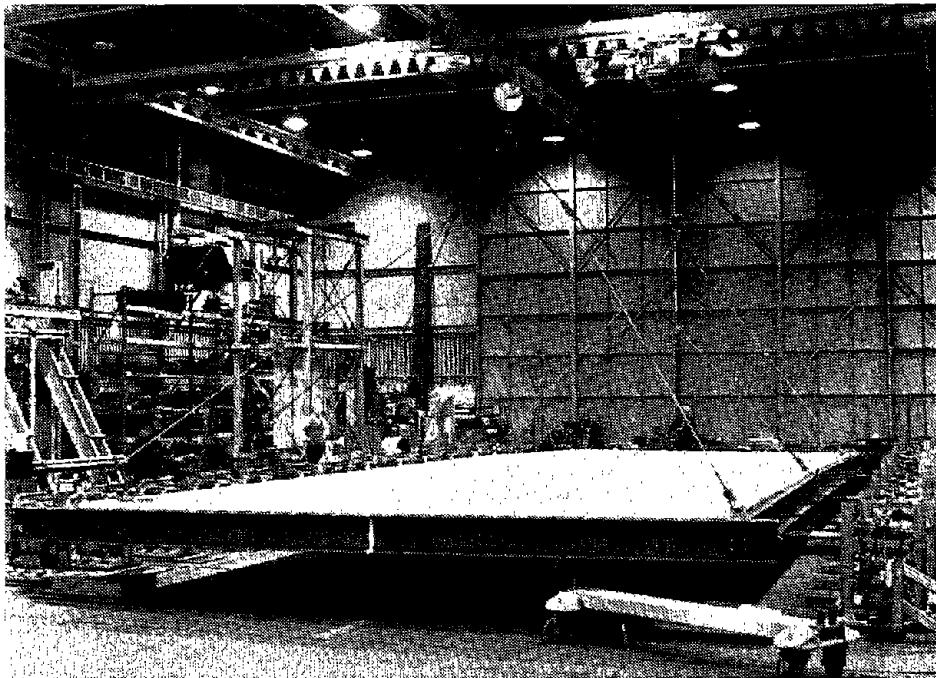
CABLE SLINGS AND LABORATORY CRANES USED TO SET DIAPHRAGMS IN PLACE FOR TESTING.
